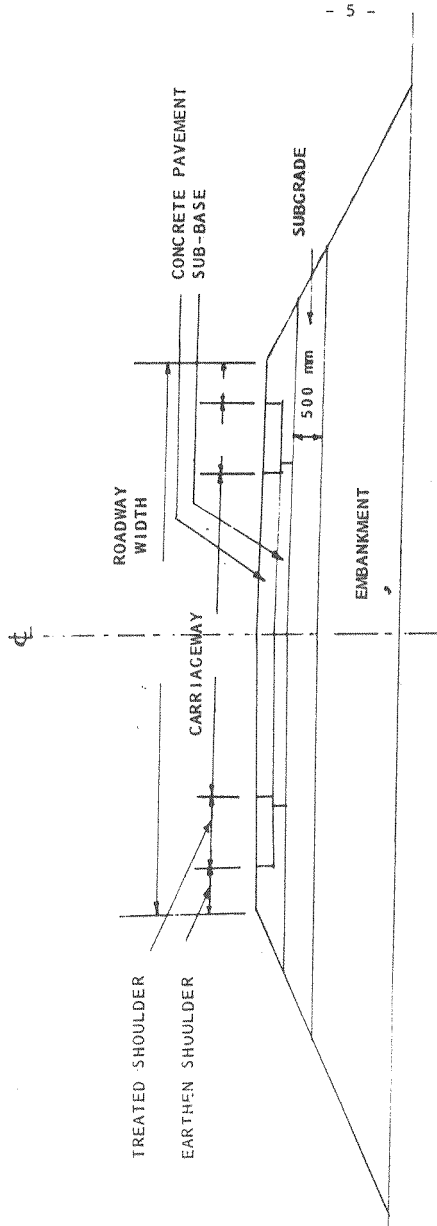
Terms used in the specifications to describe road cross-section elements with a concrete pavement
